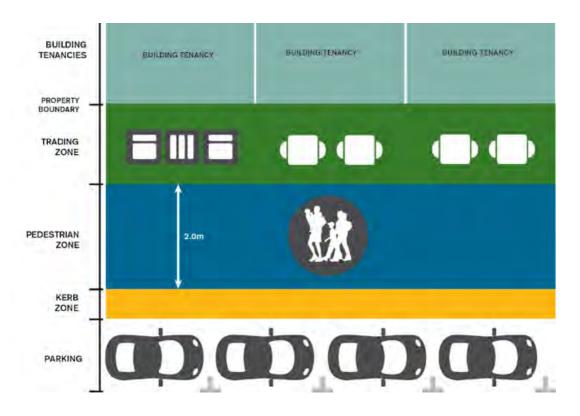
Alternative footpath zones arrangement - Trading Zone against the building and the Pedestrian Zone against the Kerb Zone
